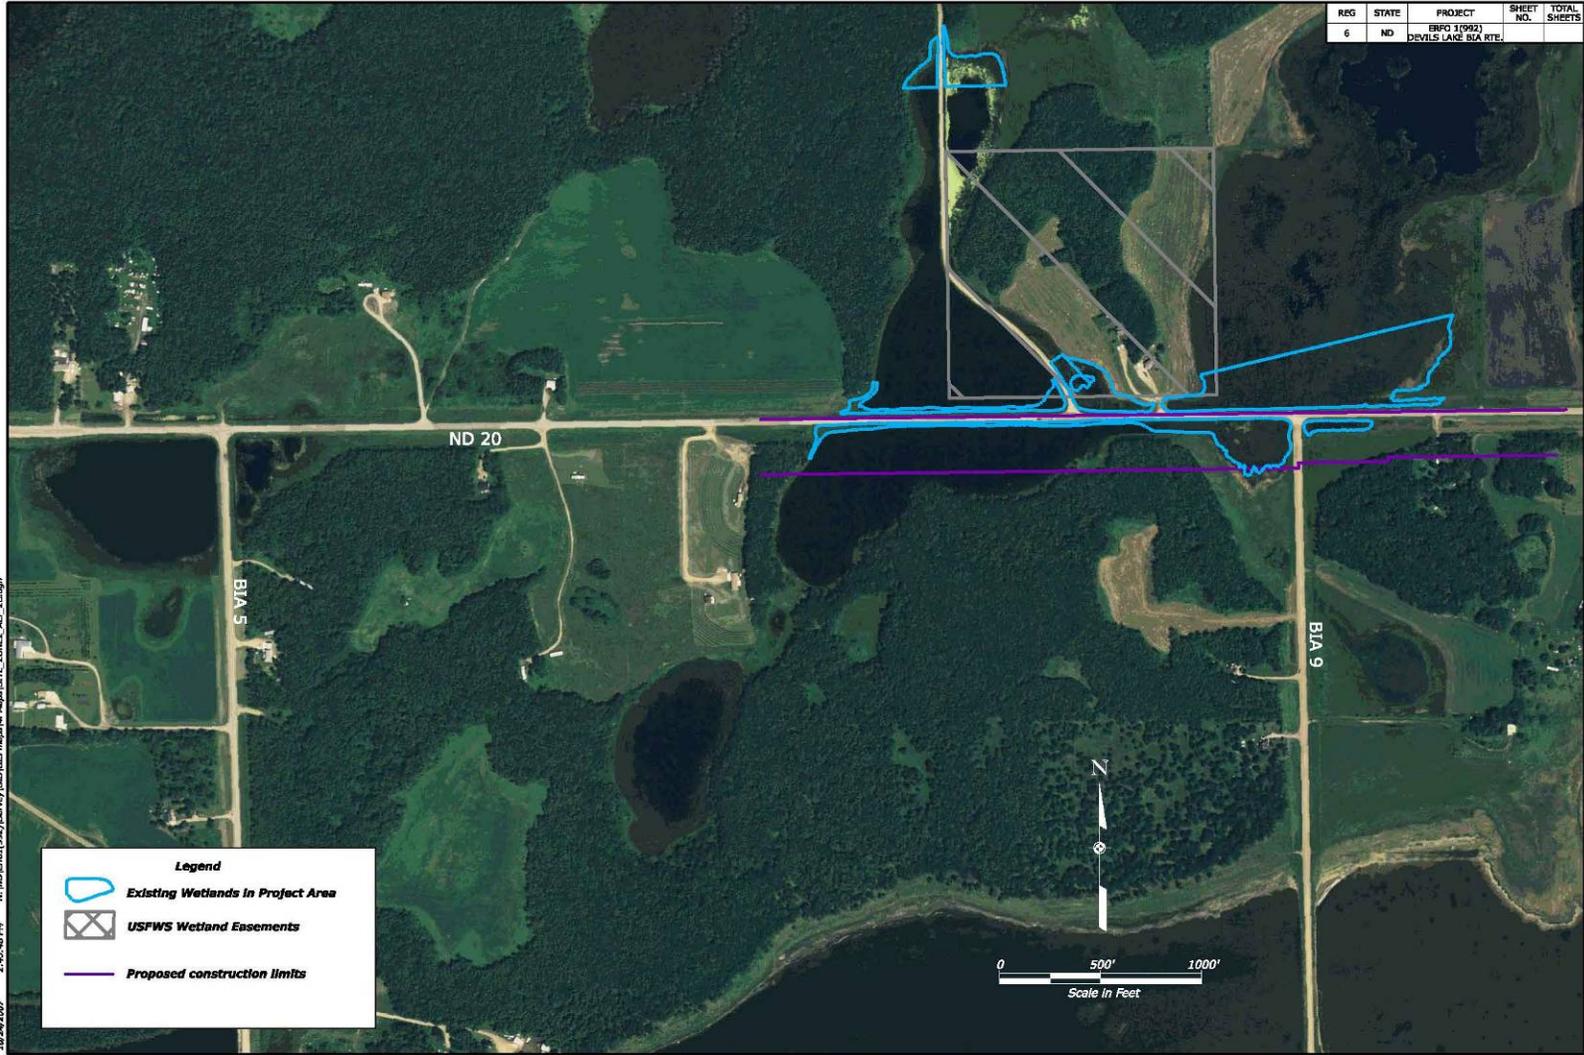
Zone 2 Alternative 2-C – Wetland Easement Tract Site 2
